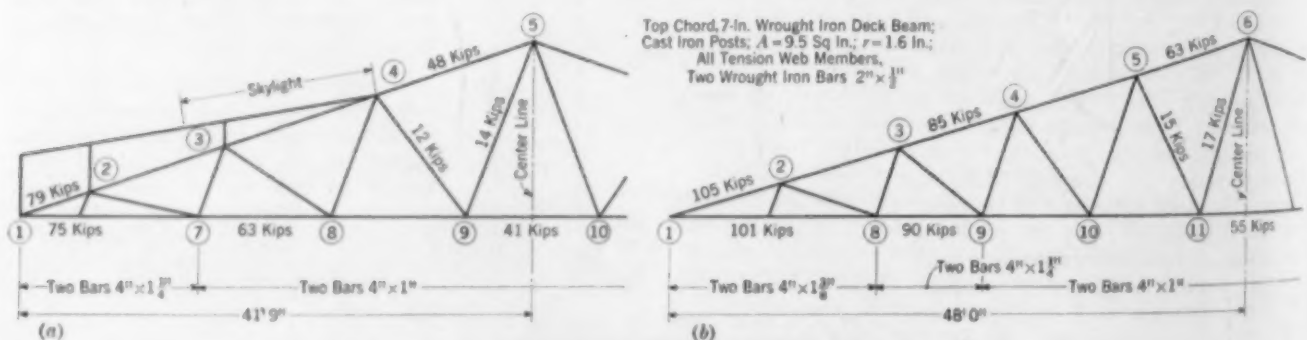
HALF ELEVATIONS OF ROOF TRUSSES, WITH STRESSES
